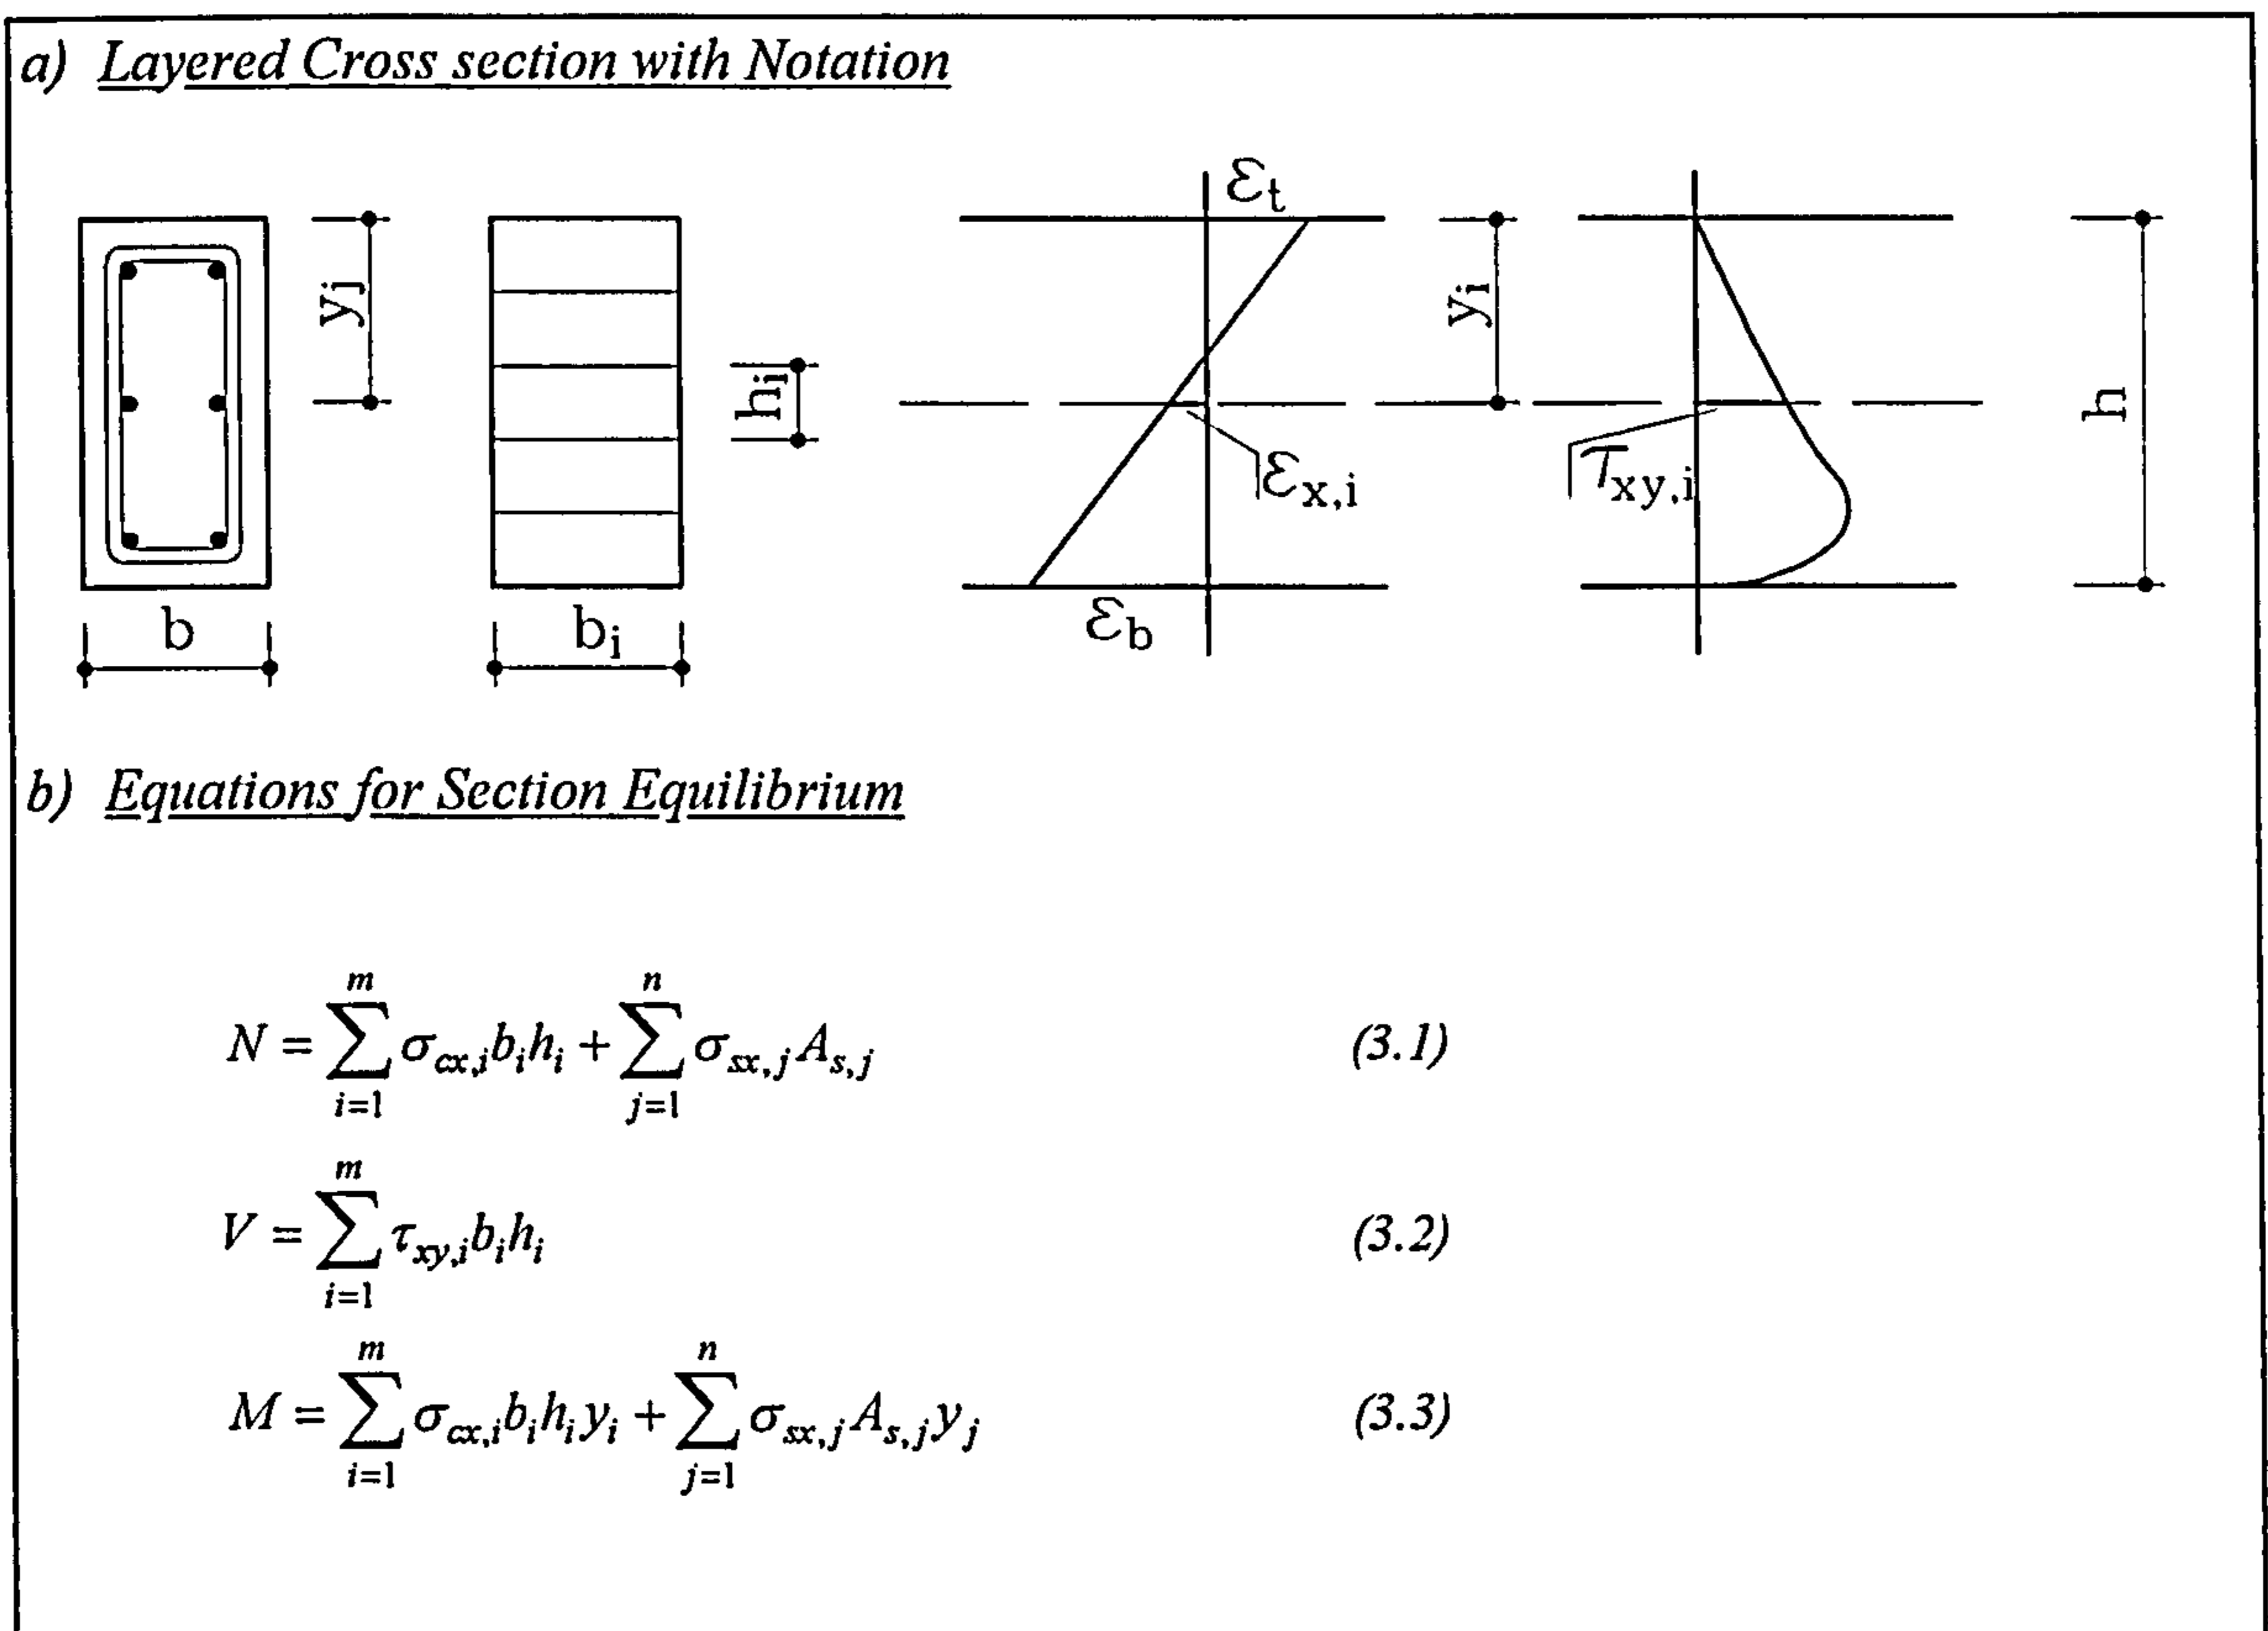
Cross Section and Section Equilibrium of the Layered Model
